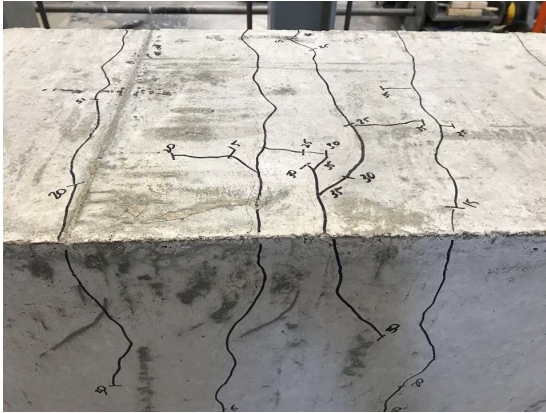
Spacing of Cracks in 100 psi Specimen
